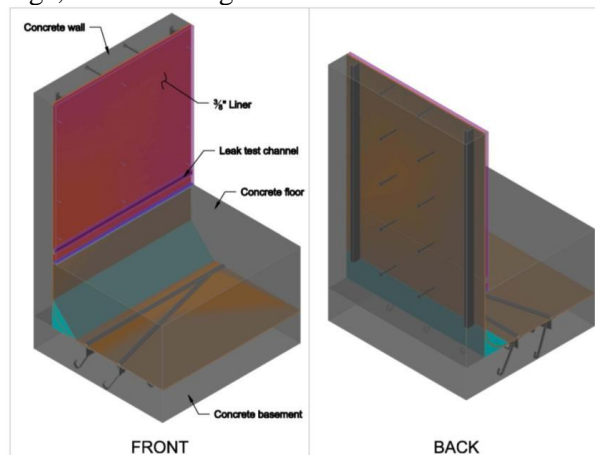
Rendering of Mock-Up of PWR Containment Wall Liner
